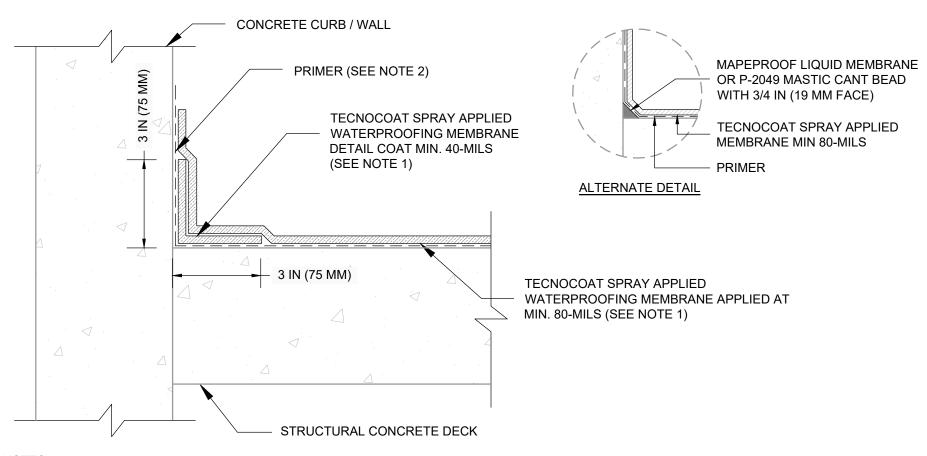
DETAILS ARE INTENDED TO BE A GUIDE FOR WATERPROOFING INSTALLATION ONLY
